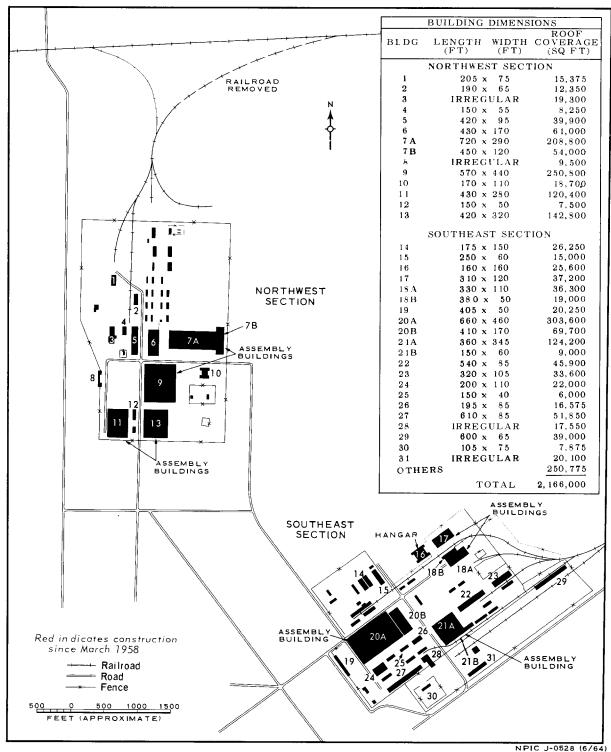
USSR: LAYOUT AND ROOF COVERAGE OF AIRFRAME PLANT NO 126 AT KOMSOMOLSK.
